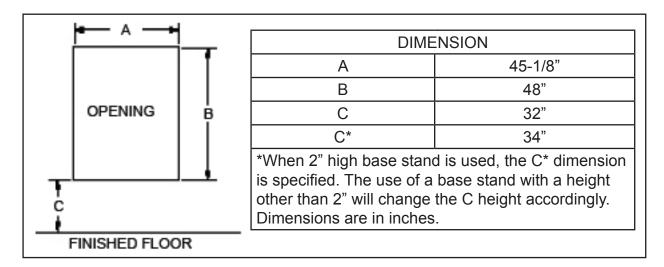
Wall Opening Dimensions for Scholar V Heat Pump and Air Conditioner.
